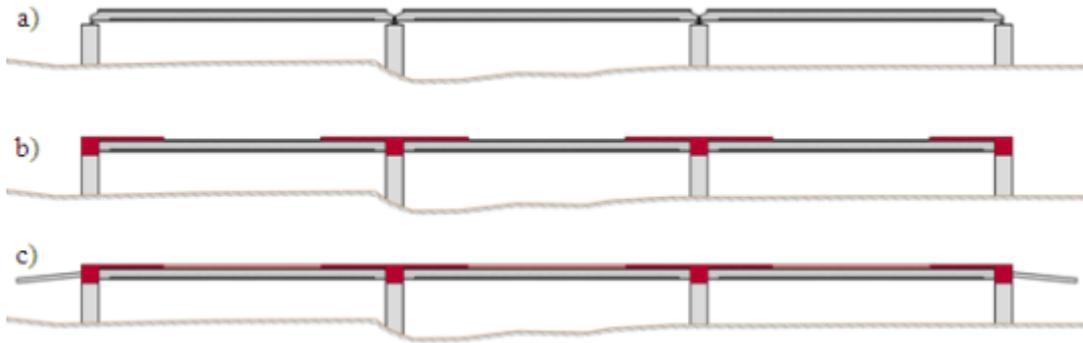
Superstructure construction phases: laying of the VFT-WIB composite girders in their final position (a), frame node and end sections of the deck concreting (b), deck concreting (c)
